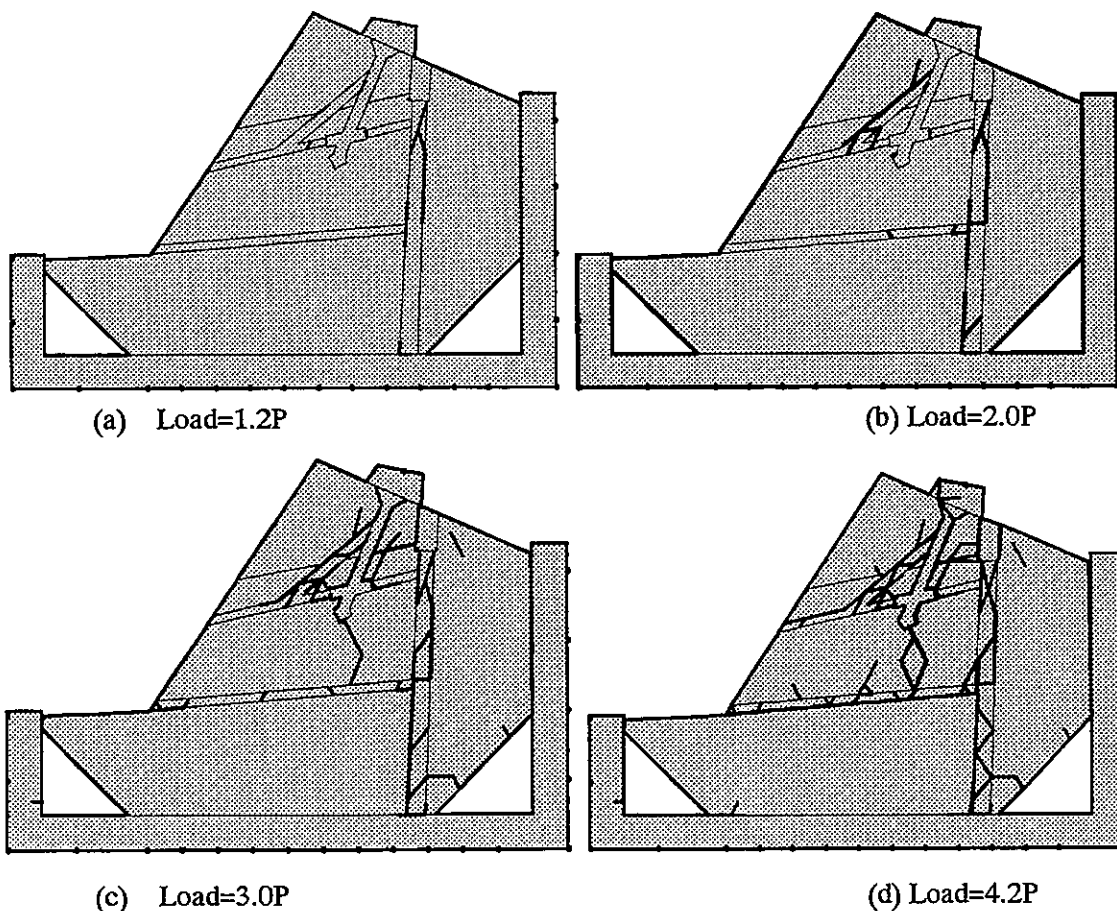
The failure of abutment after strengthened by 3.5m concrete wall
